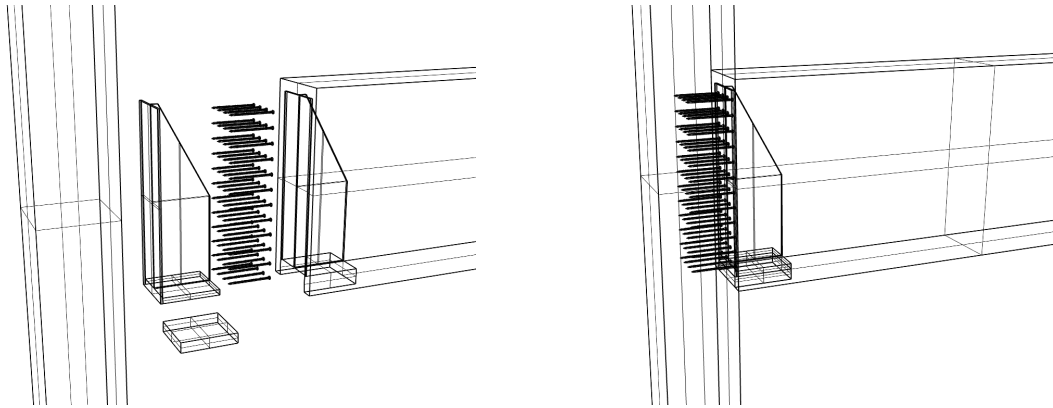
Schematic illustration of the exploded assembly of the beam–column connection showing the internal beam shoe, screw arrangement, timber beam, column, and filler block prior to installation.
